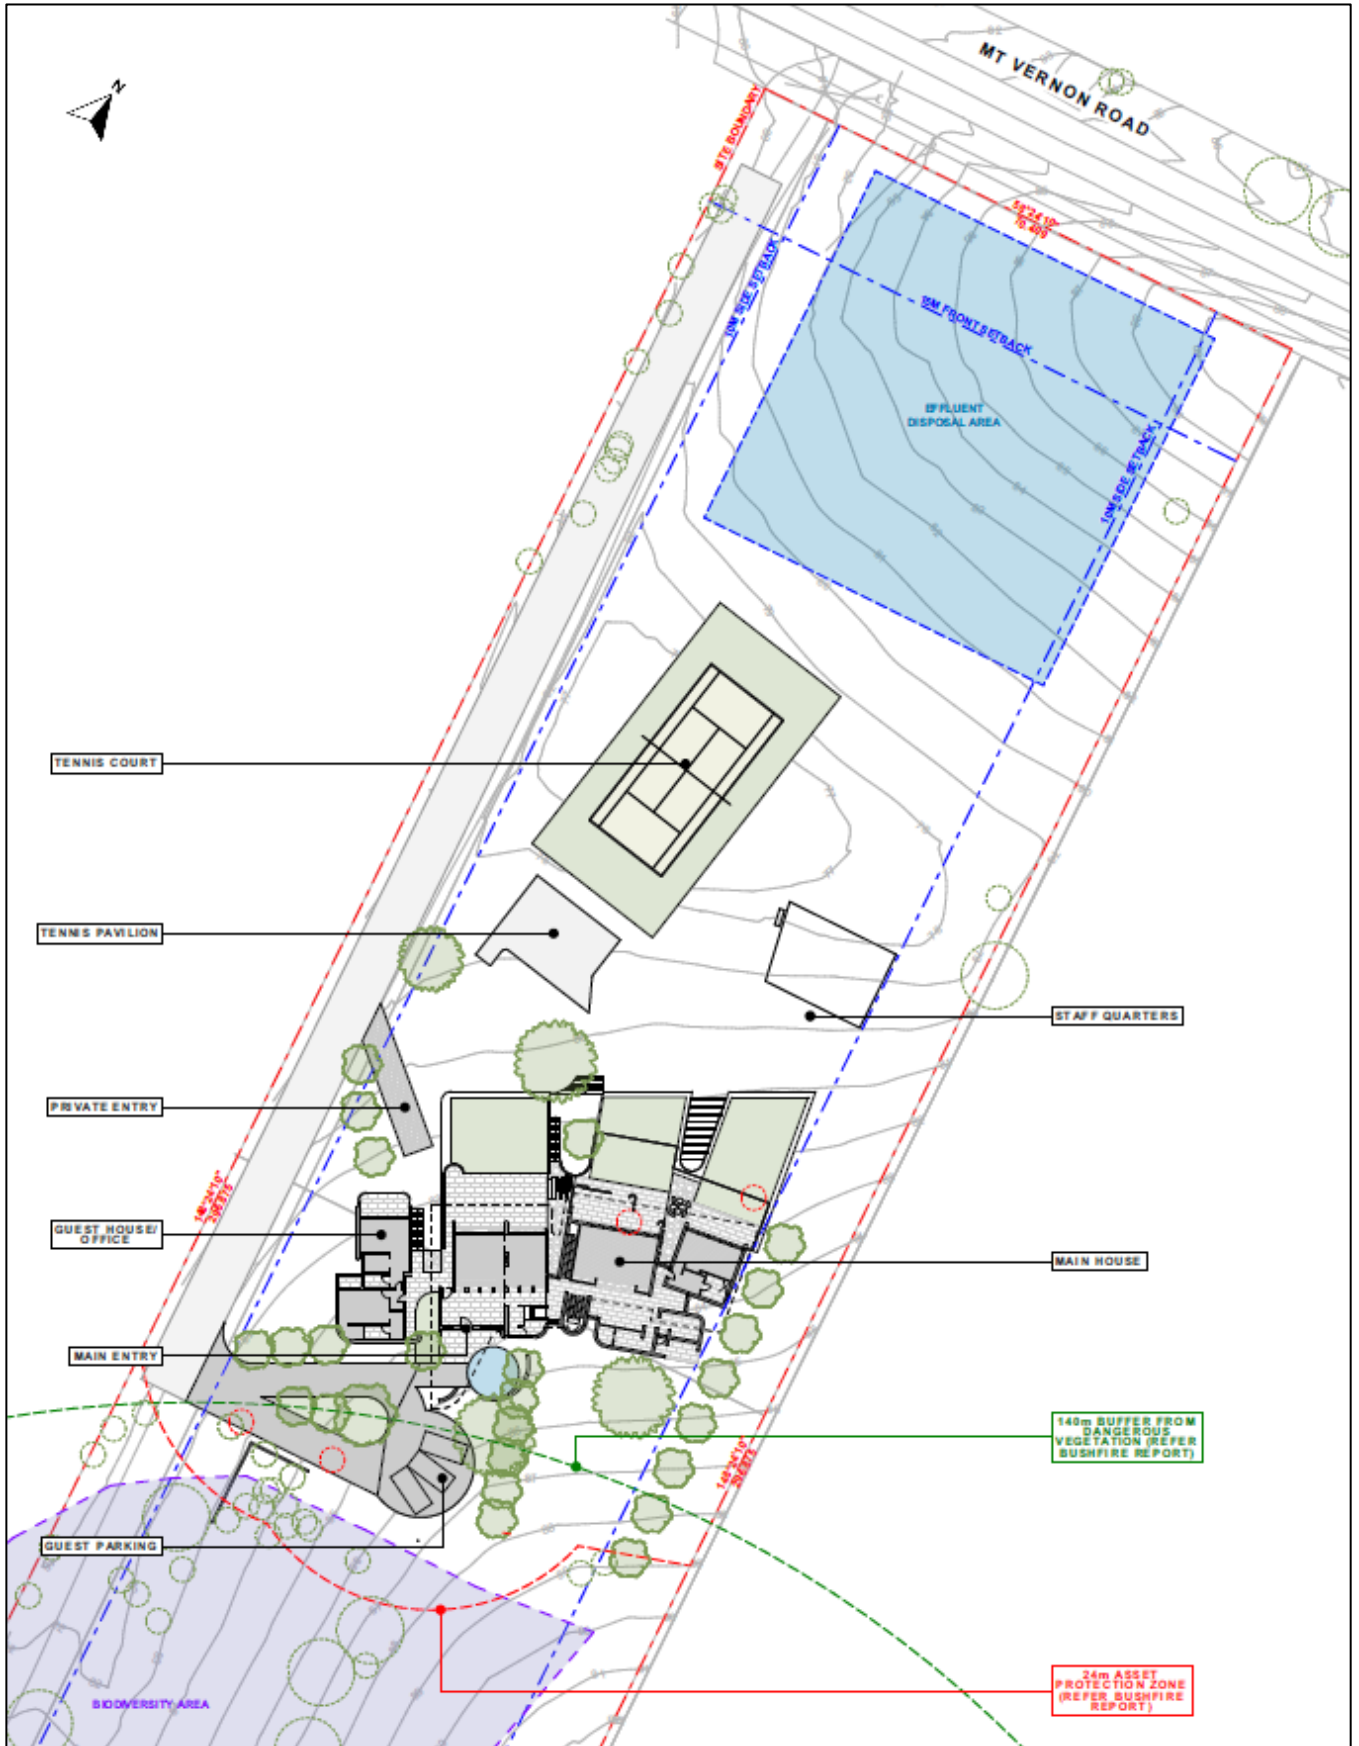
Proposed Development (Source: PopovBass, dated 2 September 2021)
